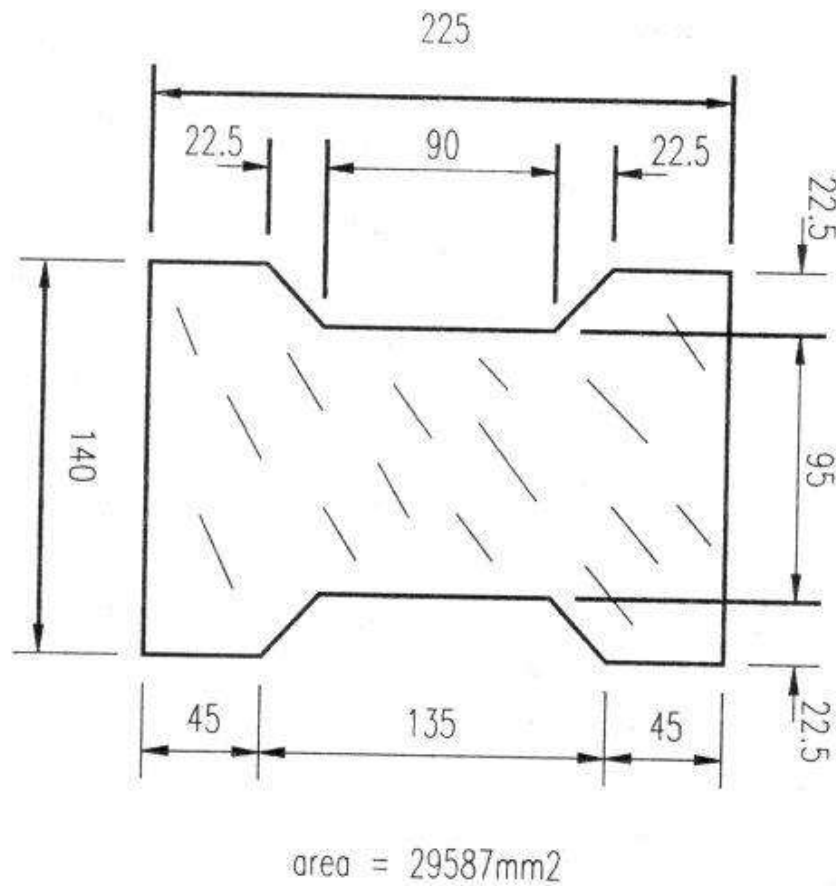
Dimension of the "Double Shaped" Concrete Paving Stone
